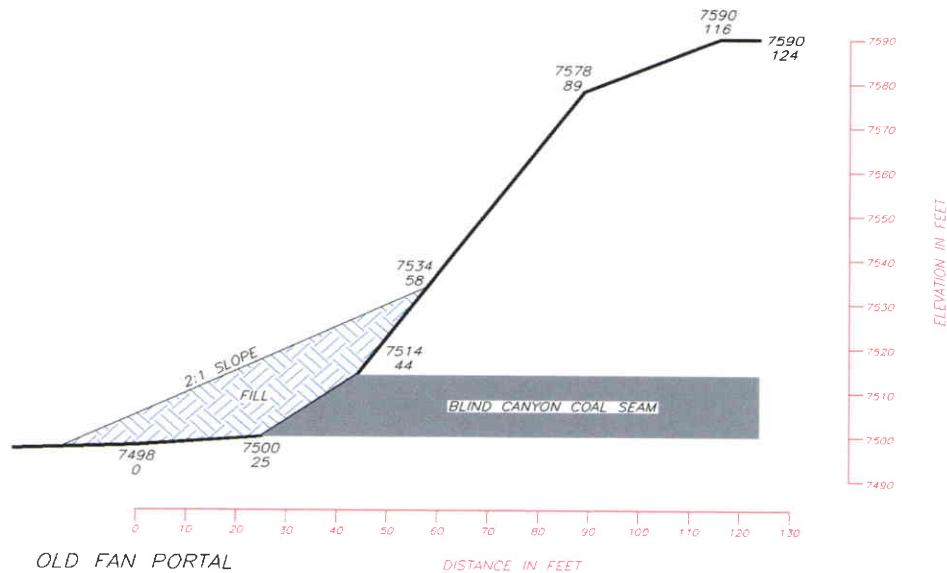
Typical cross-section of the Old McKinnon Fan Portal.
